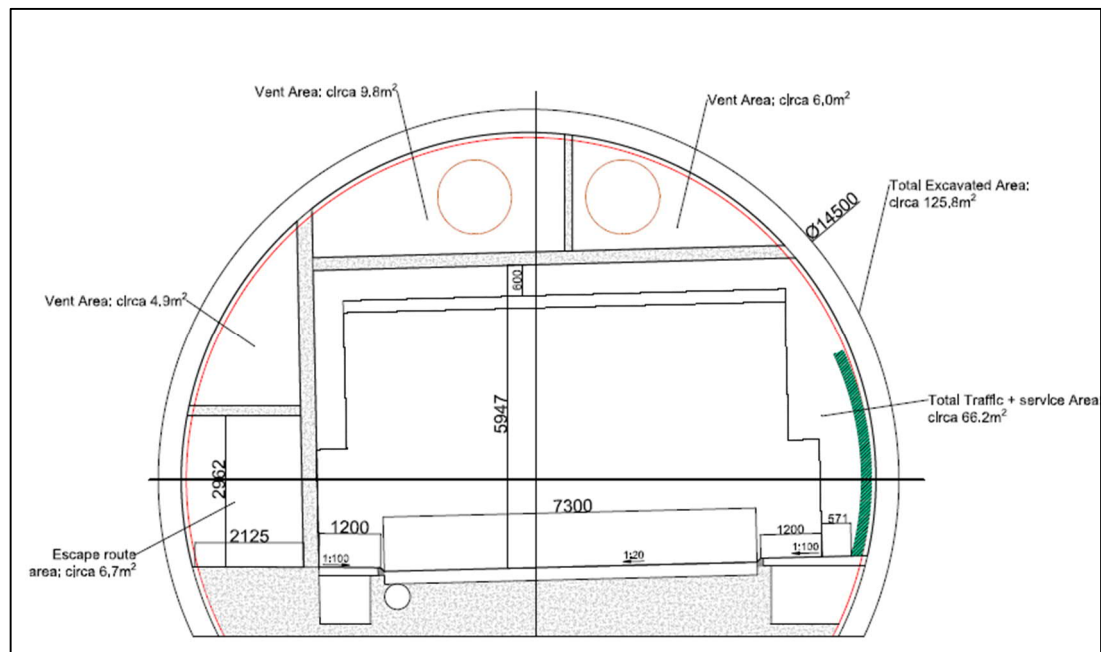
Indicative cross section for a typical single bore highway tunnel.
